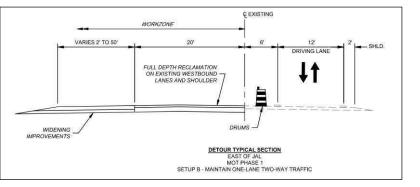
C. NM 128 MOT Typical Section – Enhanced Two-Lane Construction
